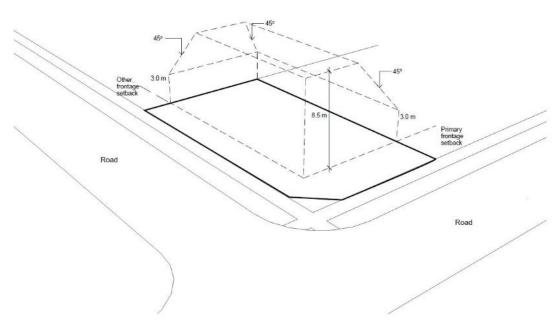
Building envelope for corner lots as required by clause 8.4.2 A3(a) and clause 8.5.1 A2(a)
